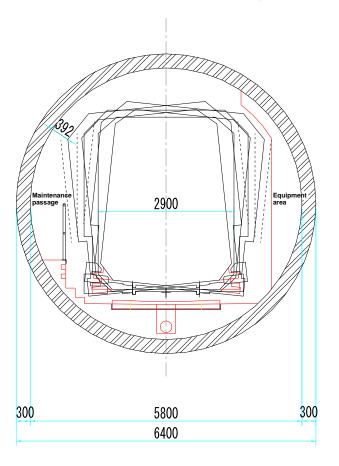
Cross Section of Tunnel based on the 3rd Rail System
